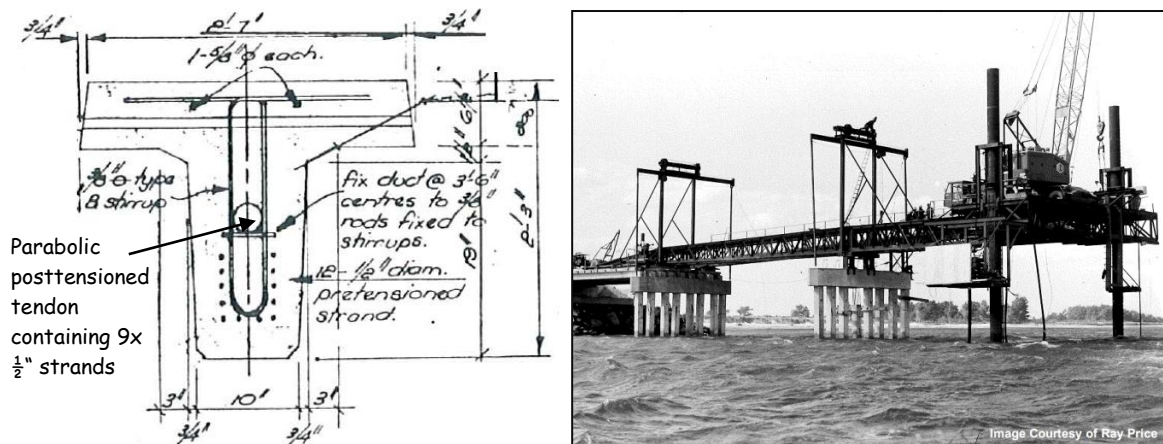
Typical beam cross-section<sup>4</sup> and image of Tiwai Bridge launcher in operation
